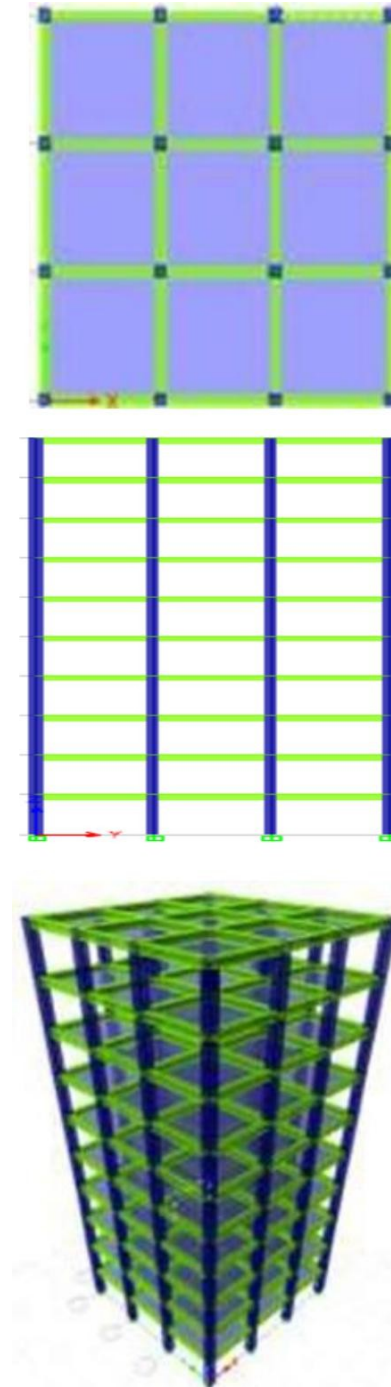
Plan, : Elevation, & 3D View of regular building model(B1)
